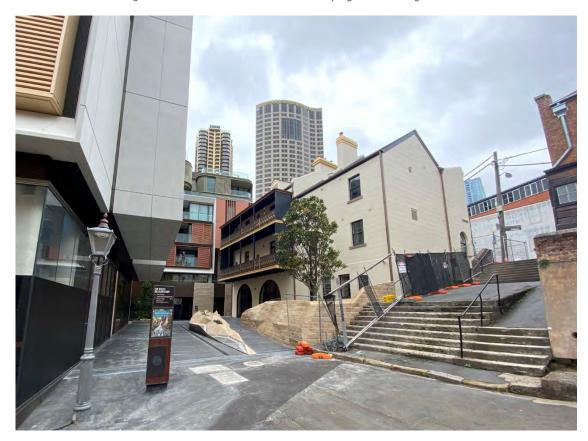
New wall at the rear of Bakers Terrace, now forming the boundary to Cumberland Place and Steps and replica I gas lamp.
